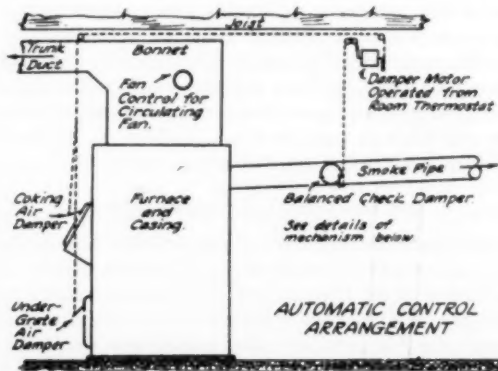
ARRANGEMENT OF COMBINED CHECK DAMPER AND DRAFT REGULATOR
